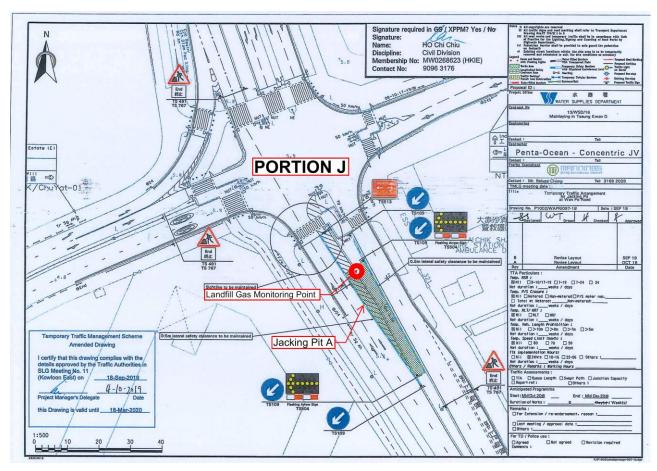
Location Plan for Portion J – CH. A13+50 to CH.A 14+00 (Pit A)
